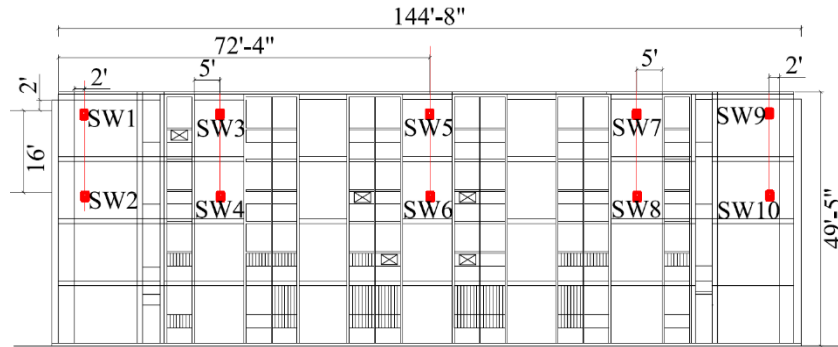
South-west elevation of HB Building with driving rain gauge locations
